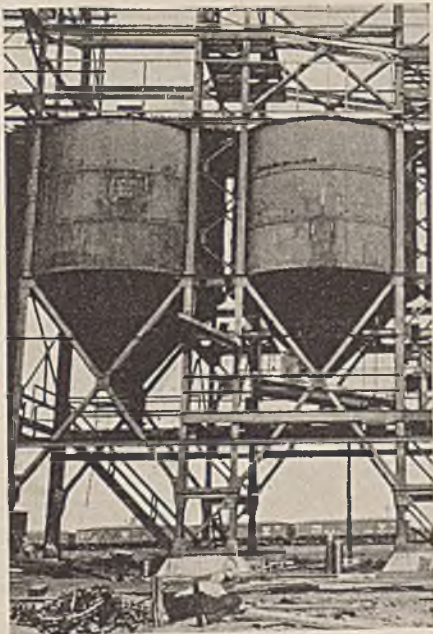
Curved Sheets Were Welded Over Worn Spots in Bin
